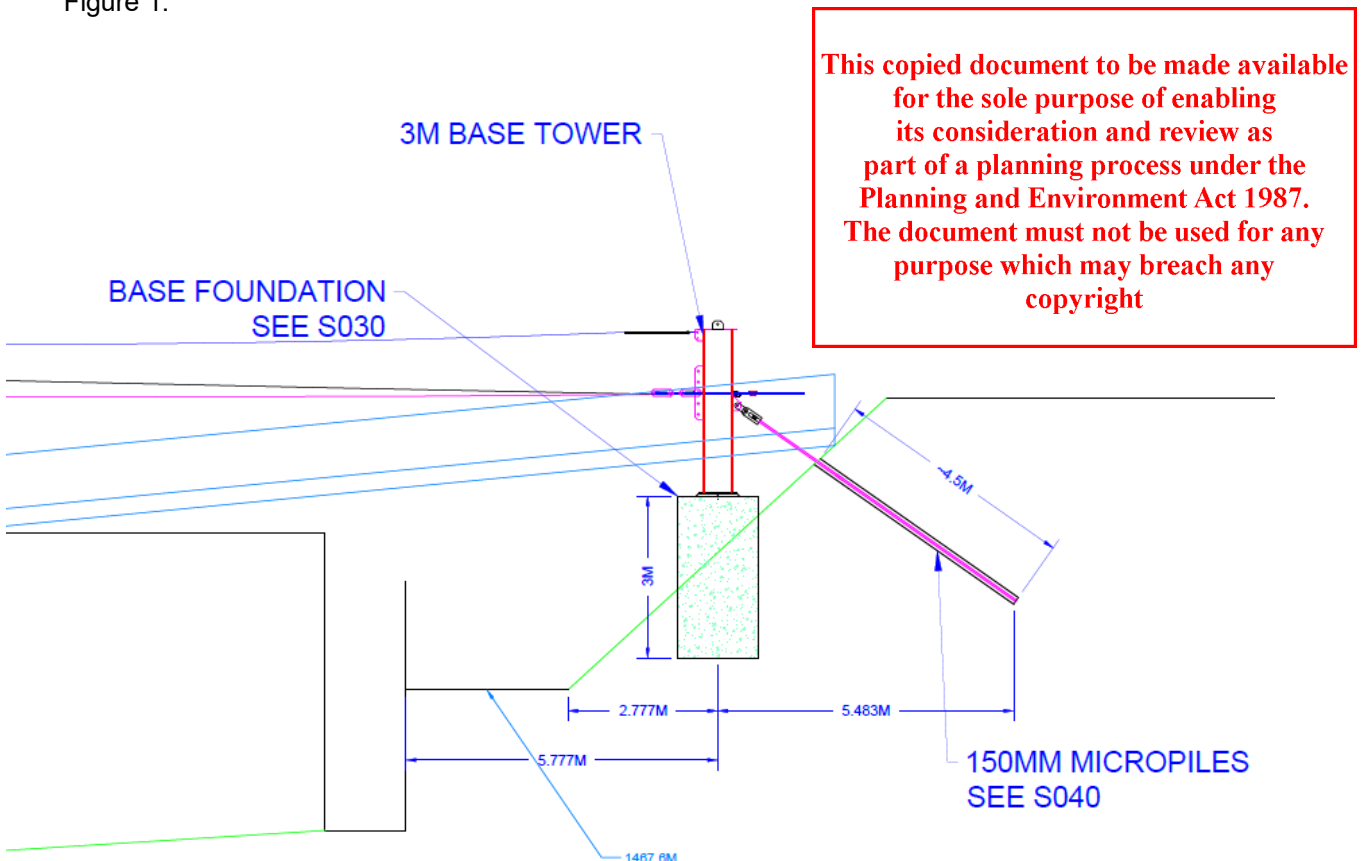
Extract from provided drawing A002 – illustrating construction plan for landing foundation and micropile anchors.
